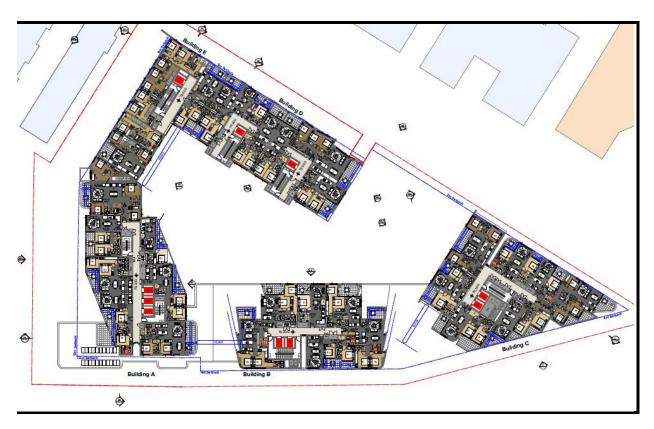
Proposed Level 5 - lack of building Separation (Source: Turner, March 2023)
